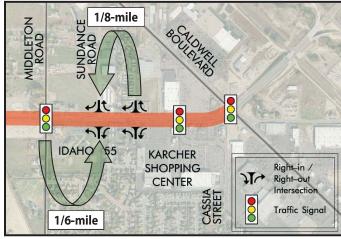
Urban segment – Middleton Road to Caldwell Boulevard
